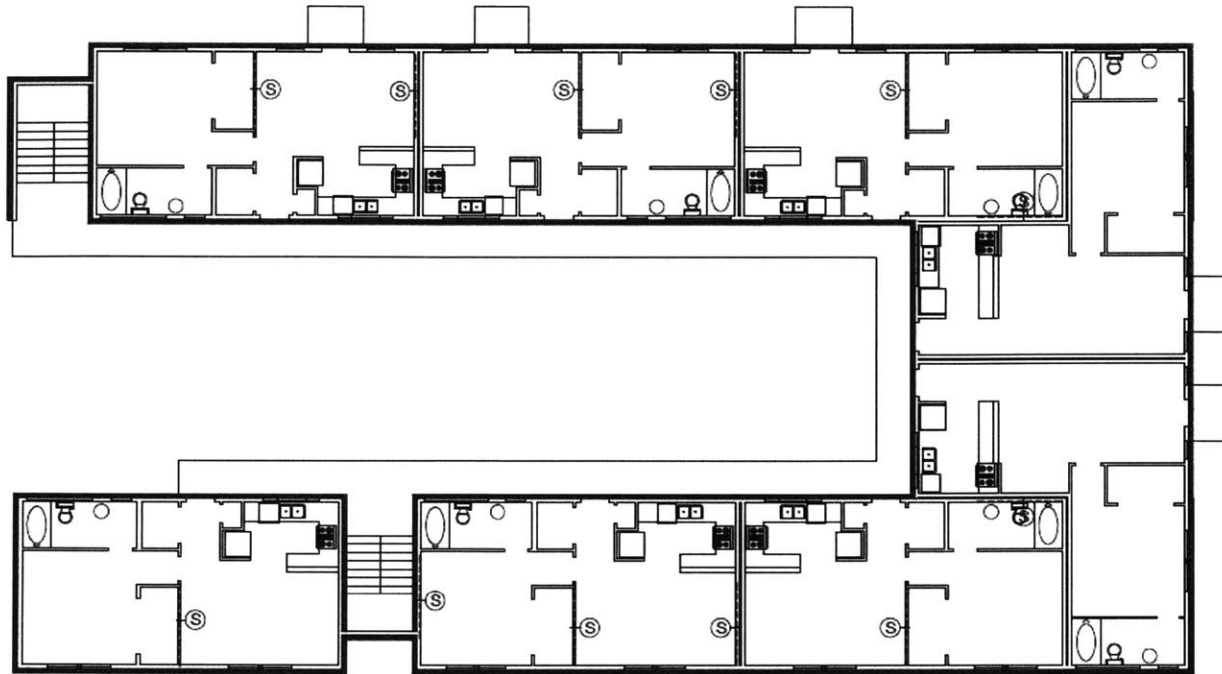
3rd Floor Plan – 8 One Bedroom Units (Graphic Provided by Owner)
